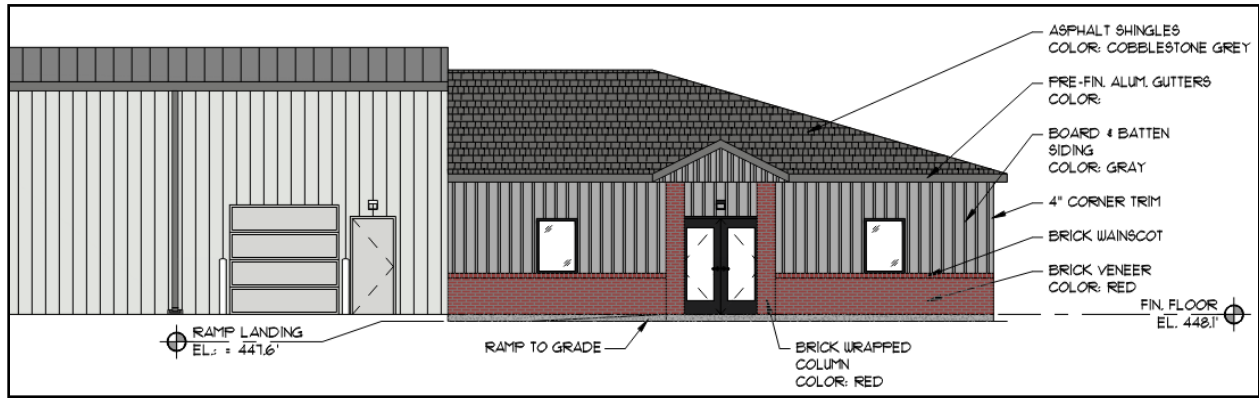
Screenshot of Proposed East Elevation (Facing Walsh Ct).
